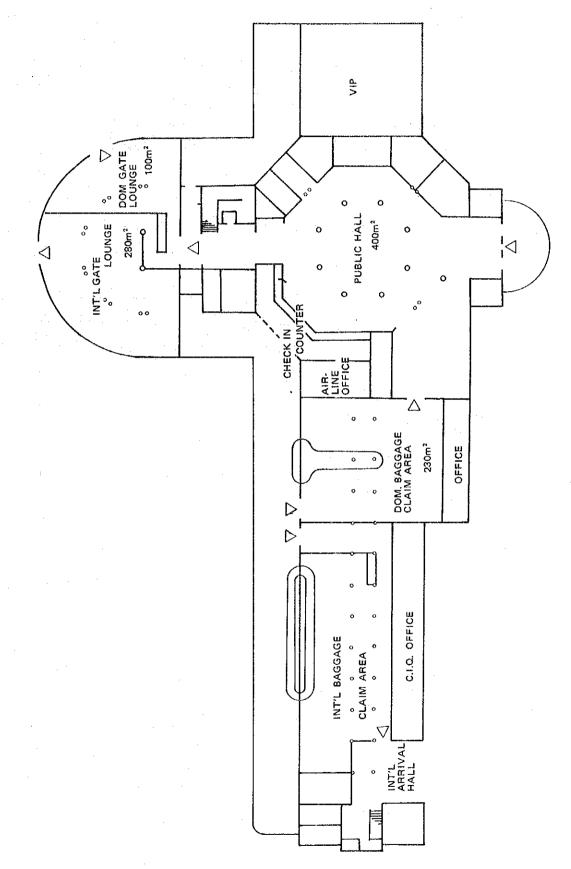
Improvement Plan of Passenger Terminal Building
